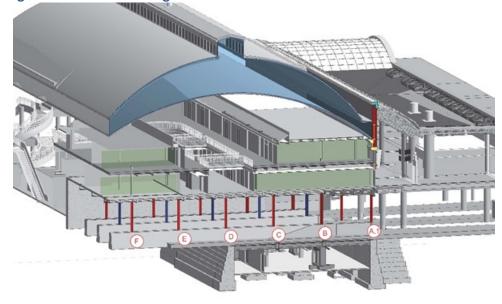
Model Showing Subbasement and Columns to be Removed
